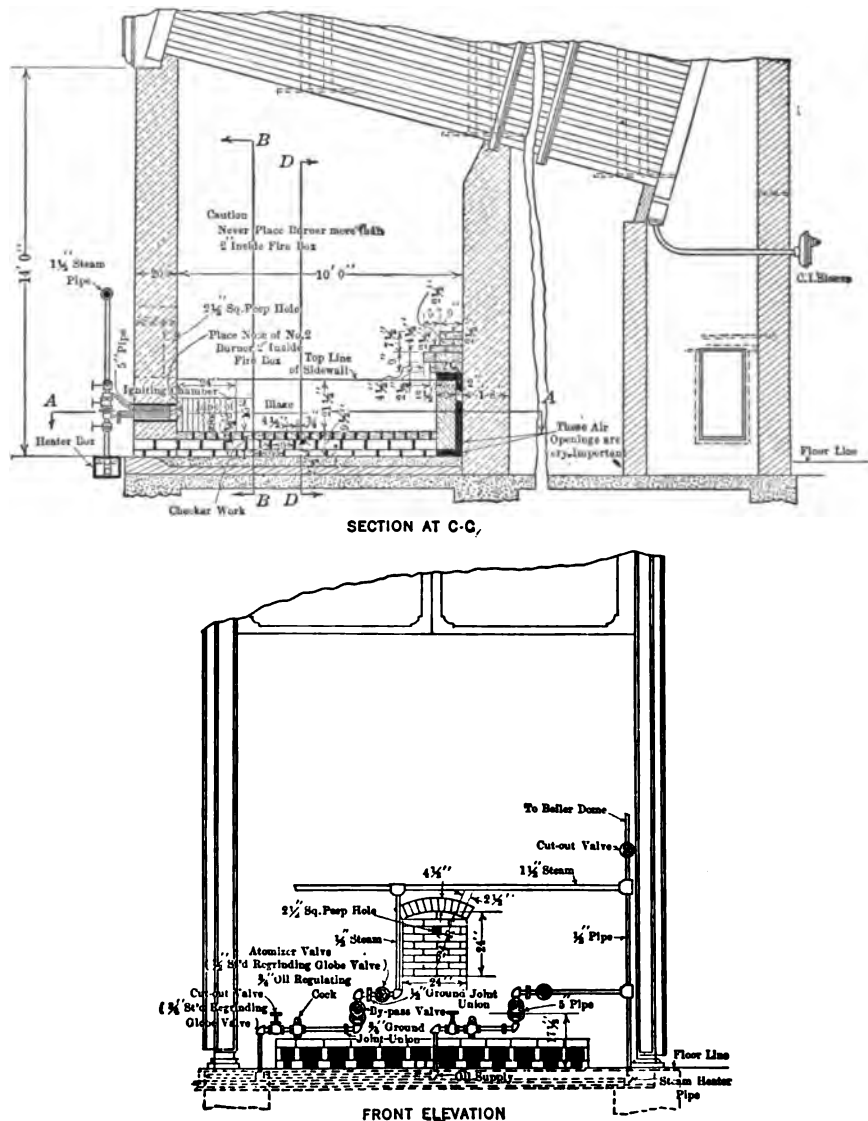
B. & W. boiler equipment, front end view showing location and piping of burners.
